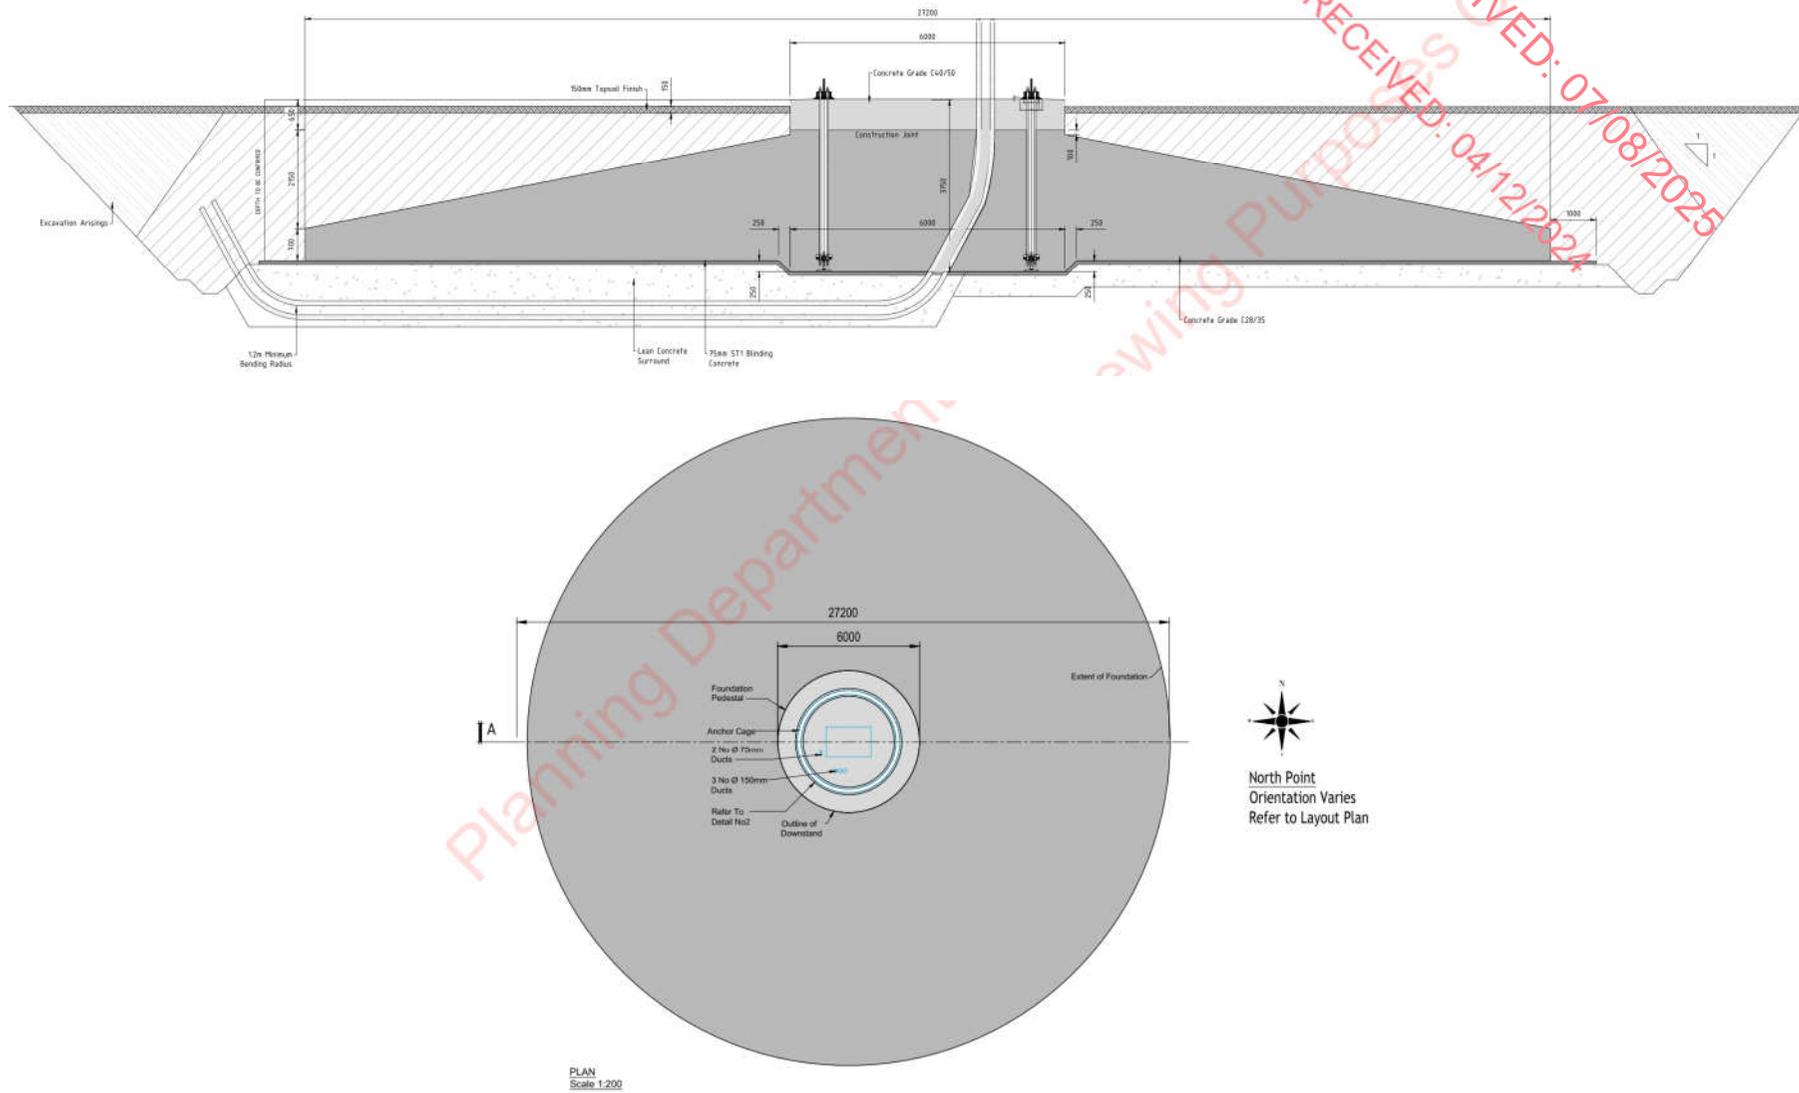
Typical WTG foundation detail (Drawing no: 6918-PL-502 Proposed foundation, Ref. [12])
